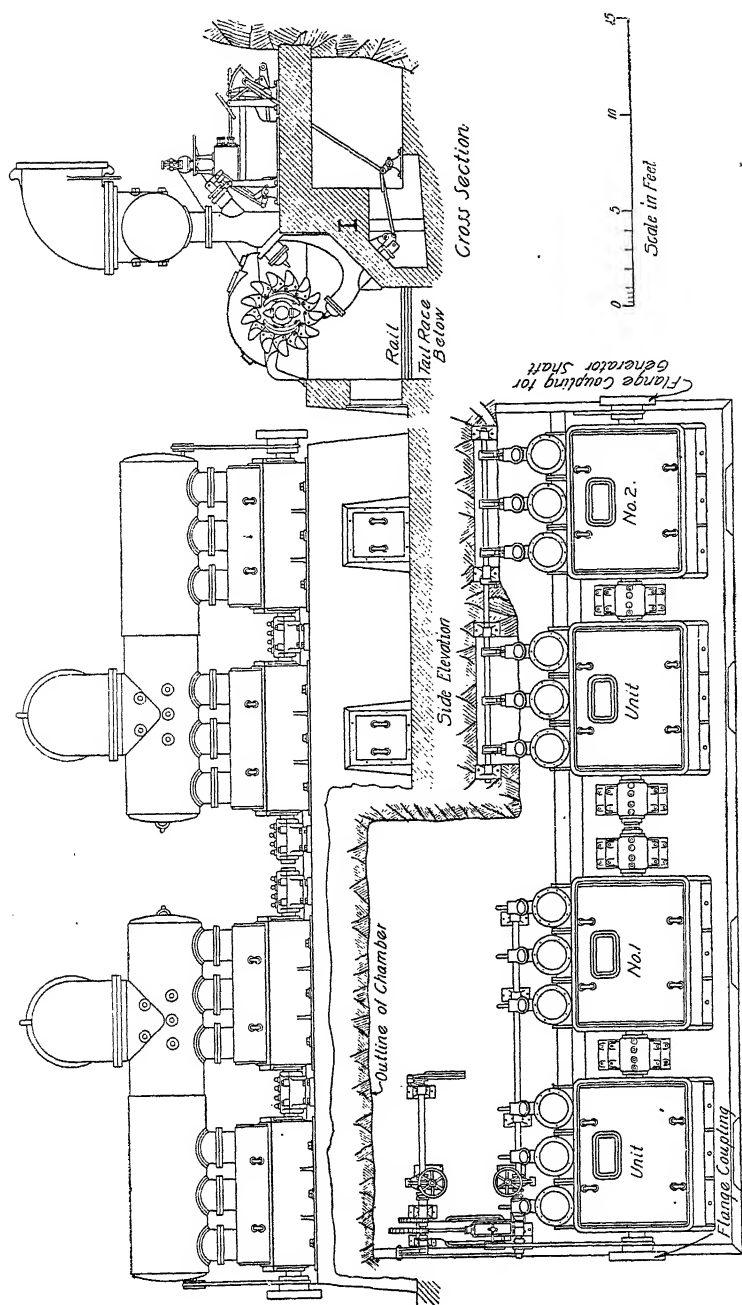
Elevation, Plan, and Section of Water Motors in Plant of the Snoqualmie Falls Power Company, Washington
